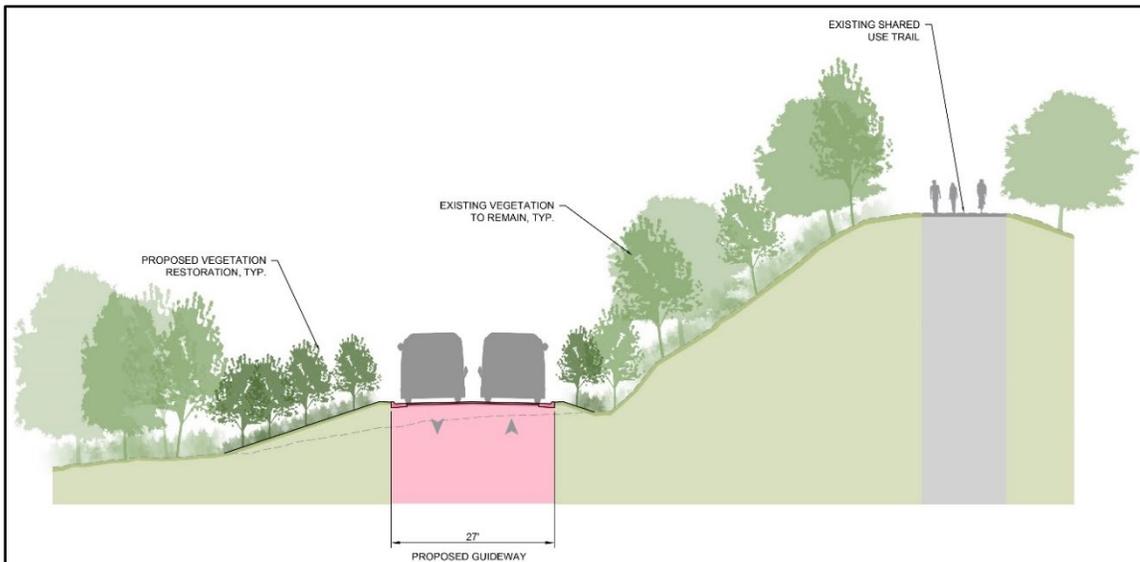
EXAMPLE GRADING OF THE CORRIDOR JUST SOUTH OF BEAM AVENUE WHERE THE EXISTING TRAIL WILL REMAIN IN PLACE (LOOKING NORTH)
